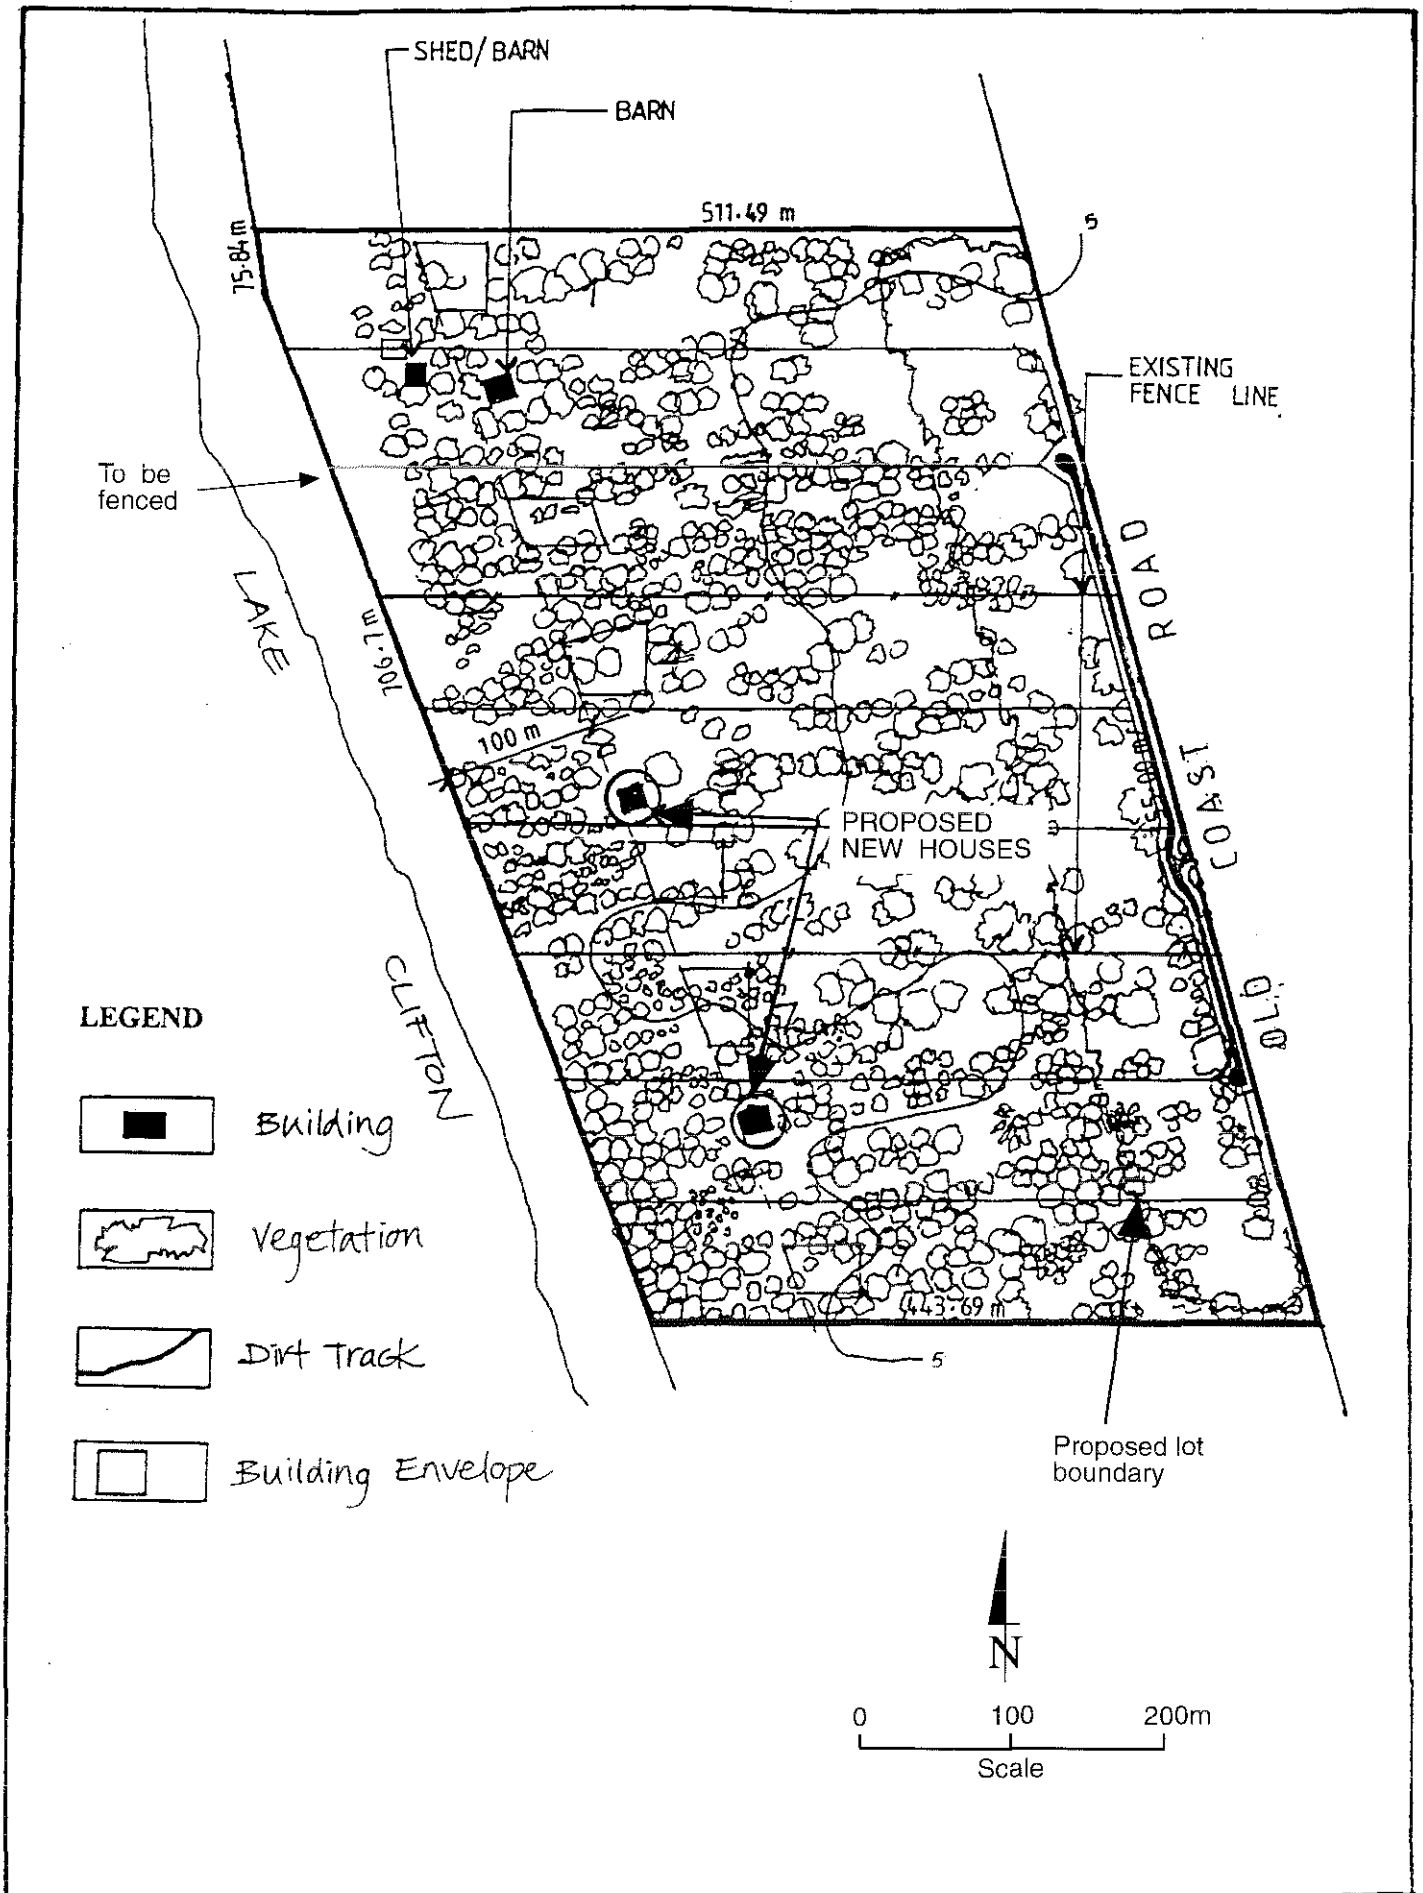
Lot 6 Old Coast Road. (Source: SJB Town Planners)
